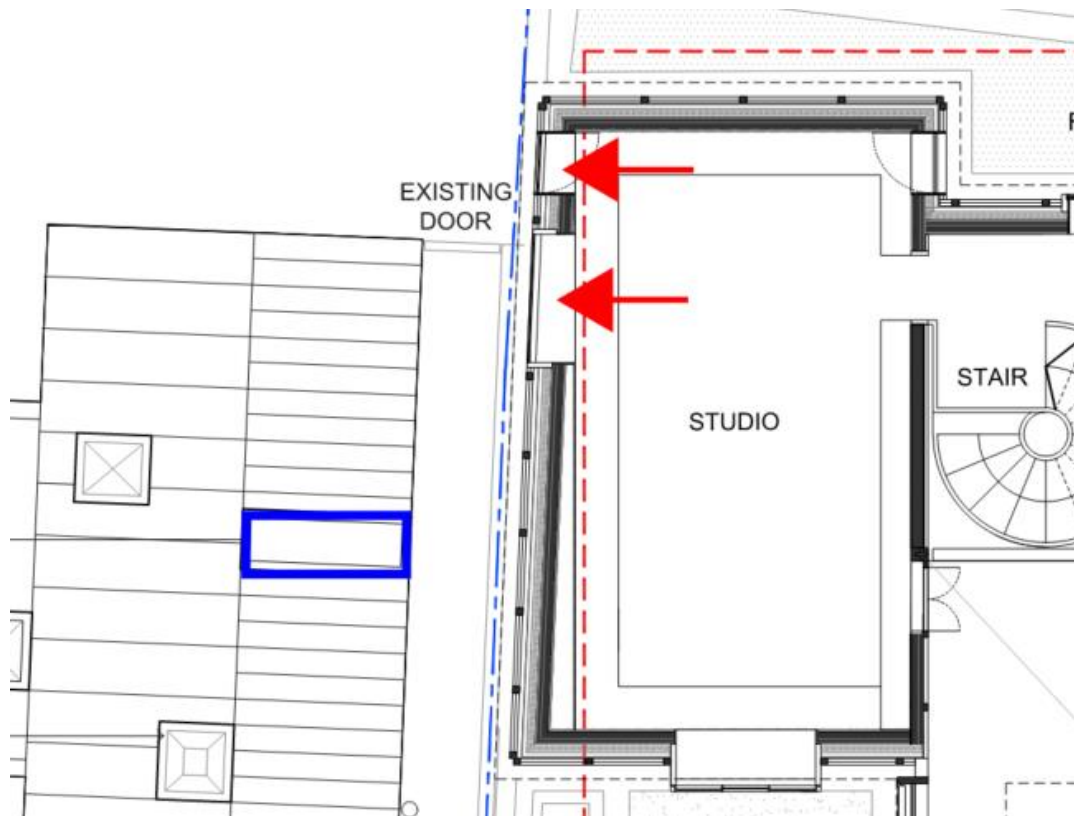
Proposed first-floor plan demonstrating amenity impact to neighbouring no.4 Bacon's Lane. Red arrows indicate outlook from the subject site. Blue square outlines an existing rooflight at no.4 Bacon's Lane's east facing roof slope. There are no other windows or rooflights along the east elevation of no.4 Bacon's Lane.
